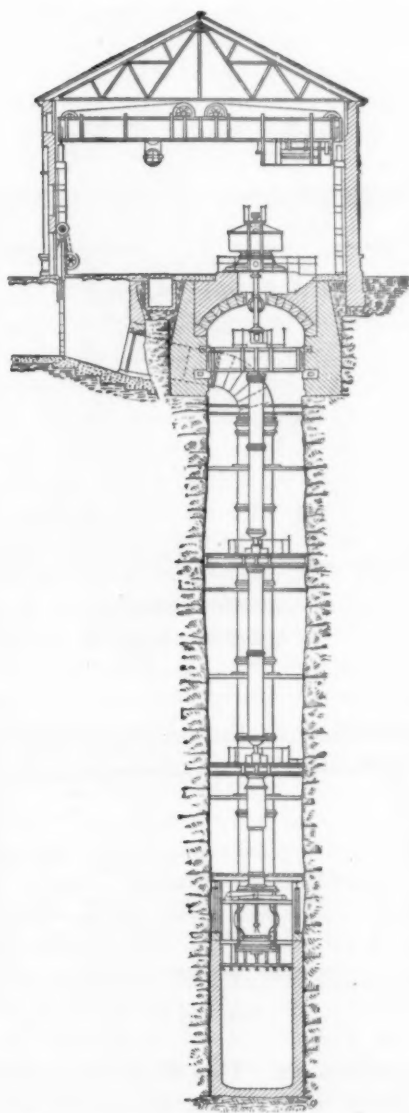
CROSS SECTION OF POWER HOUSE AND WHEEL-PIT.
